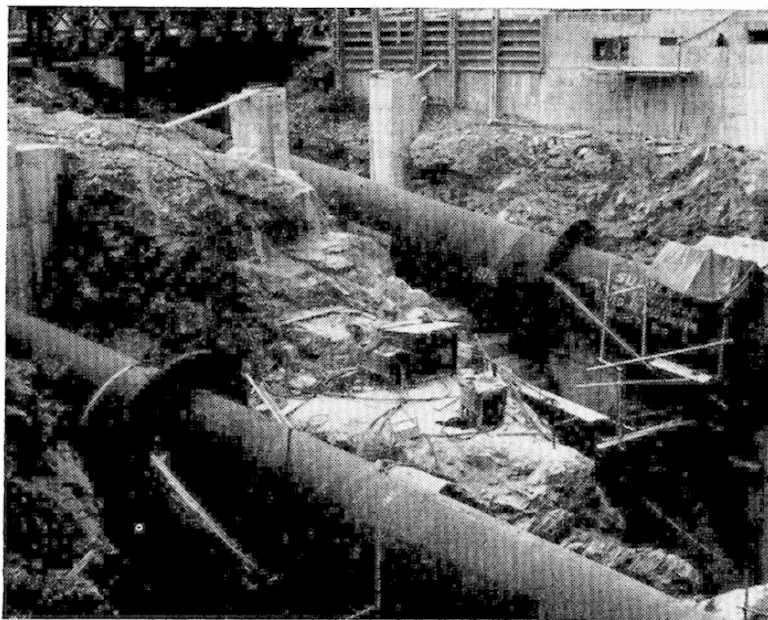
TURBINE/STORAGE-PUMP BREECHES PIPE AT SITE-WELDING STAGE
